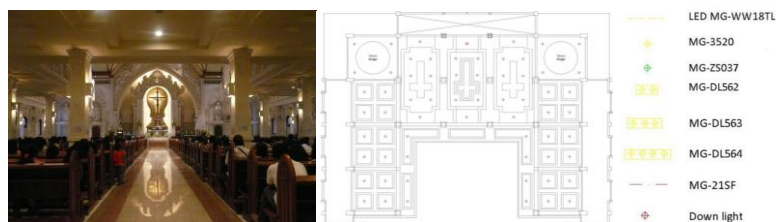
Artificial lighting in the worship hall and ceiling plan.
